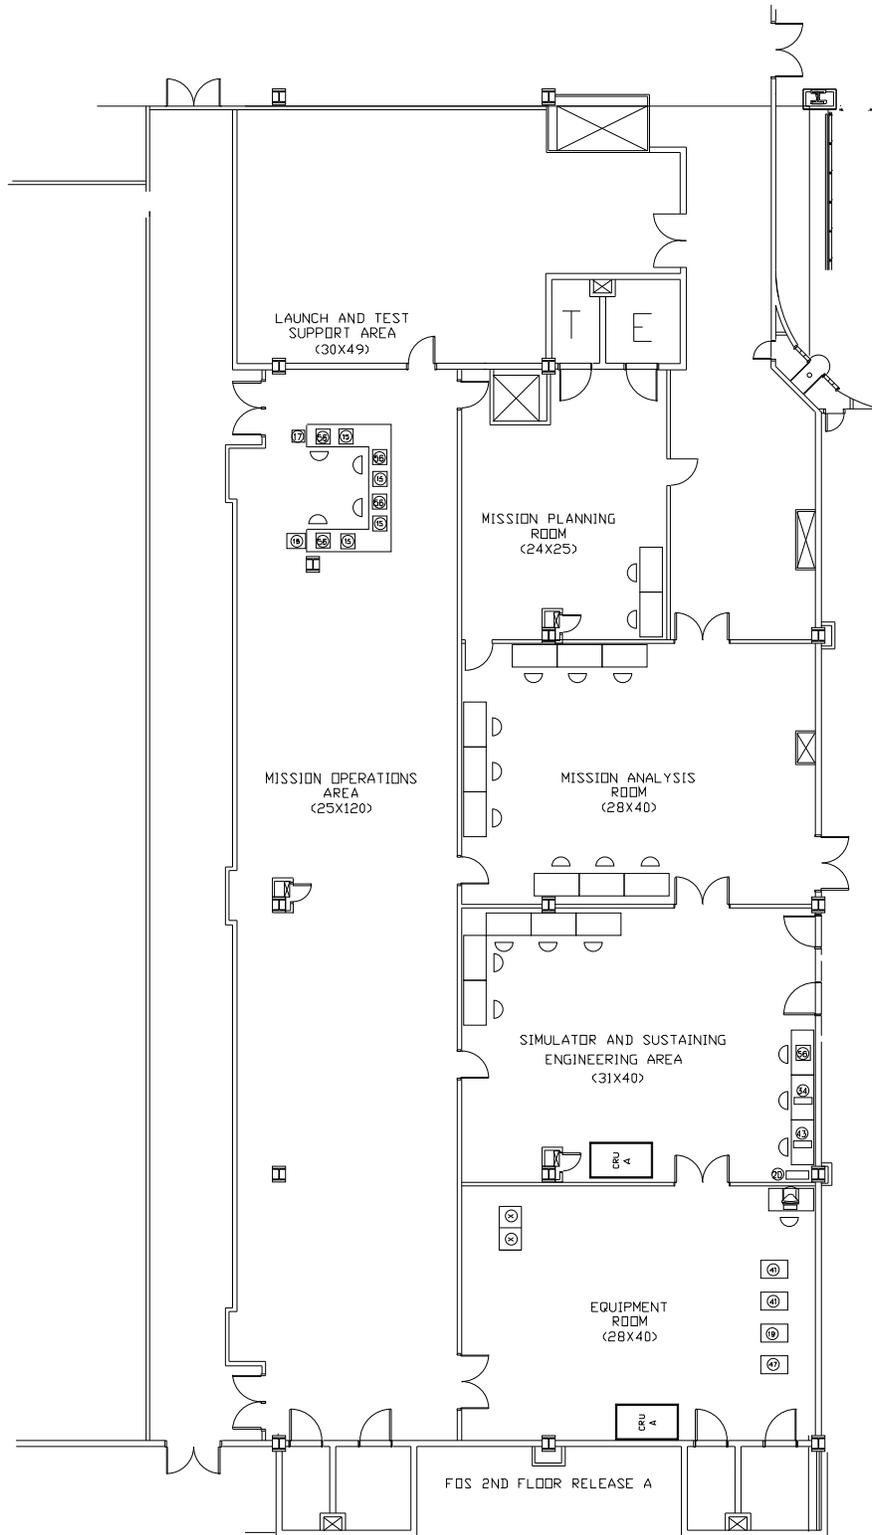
FOS Floor Plan — Second Floor (Release A)
